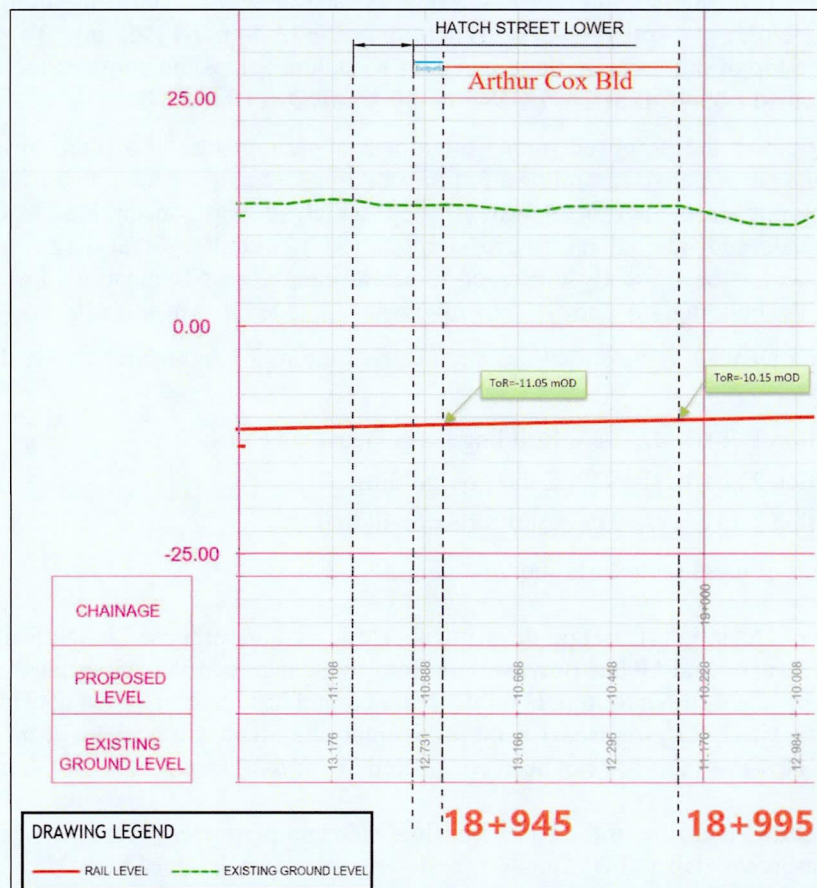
Design tunnel profile (top of rail level) from RO Long-Section Drawings
